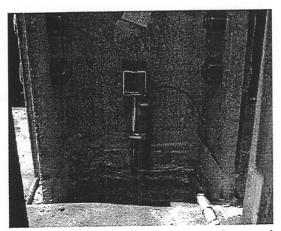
LVDT referenced for steel specimen to top of CIP slab.
